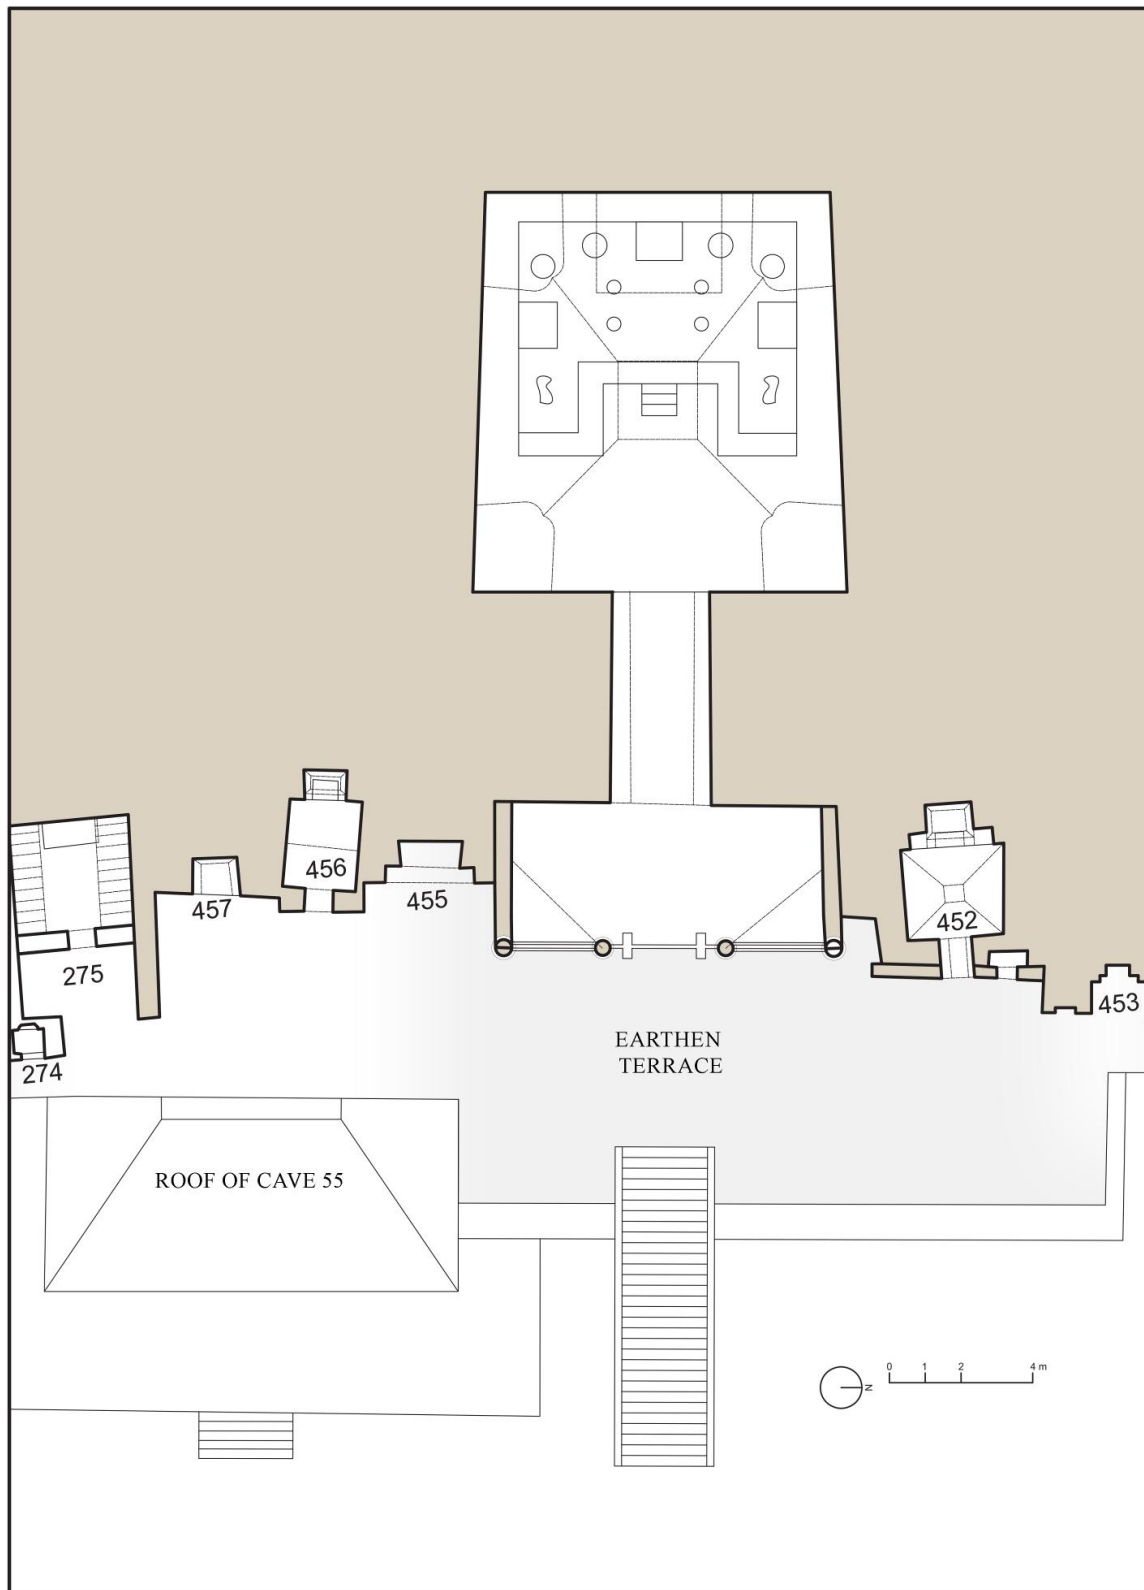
Third level plan drawing, the vicinity of Cave 454 with author's reconstruction of the elevated terrace. Drawing by author.
